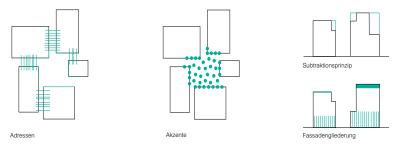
A set of general principles was developed to ensure a common approach for the architectural layout and design (Mehr, 2017).
